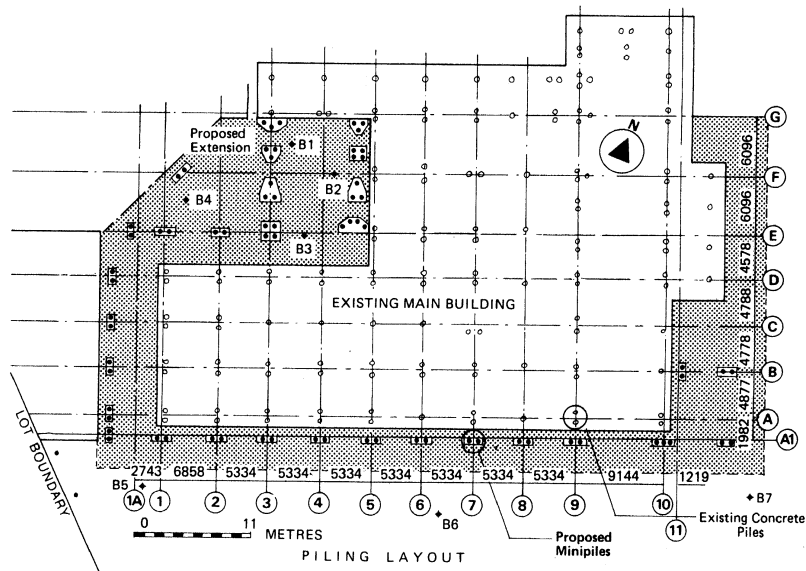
Plan of Club showing proposed extension and minipile locations.
